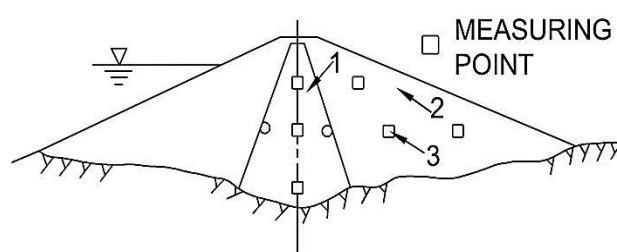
Monitoring layout for the stress in an embankment dam. 1) core; 2) dam shell, 3) dam body
